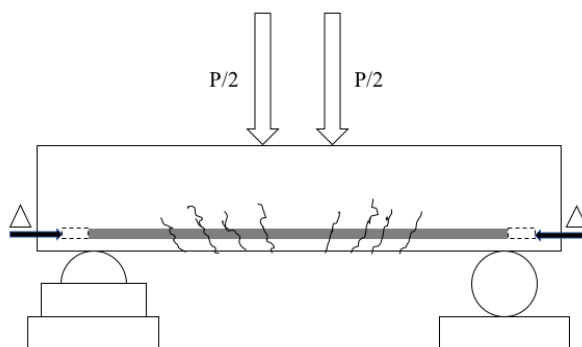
Anchorage failure of a reinforced concrete beam under applied load, redrawn based on [42]. The  $\Delta$  symbols in the figure indicates the displacement of the reinforcement towards the centre of the beam.
